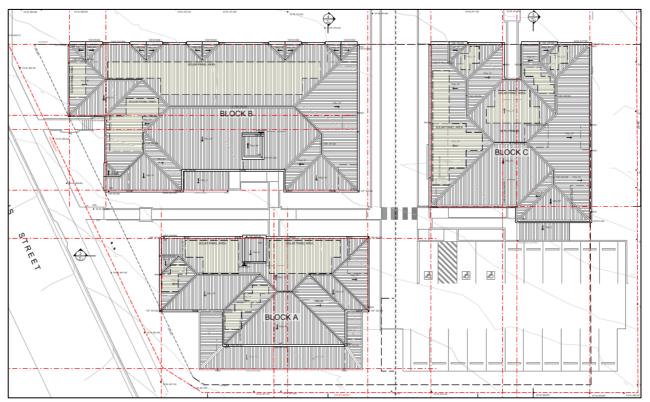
Extract from Architectural Plans – Roof Plan (Source: DEM (Aust), dated 23/08/2024)
